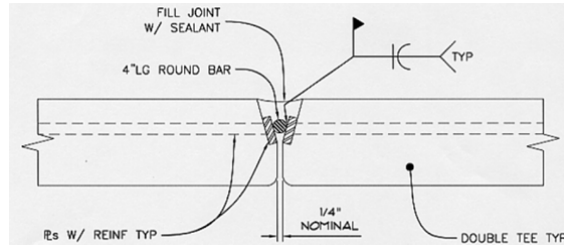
slug placed between steel plates embedded in the slab edge and final filling with sealant
